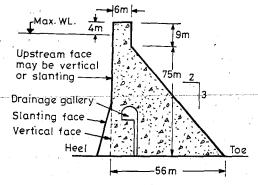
A typical cross-section of a concrete gravity dam.
